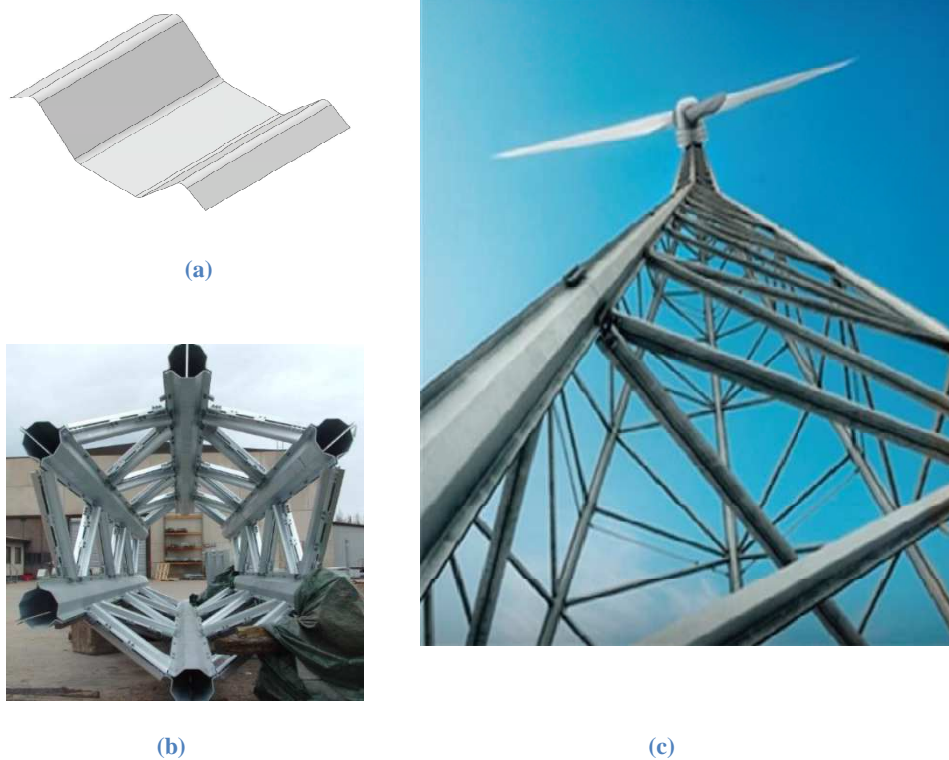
Lattice (truss) tower using semi-closed polygonal cross section, a) Steel plate, b) tower section and c) Lattice tower designed by “Rautaruukki Oy”
